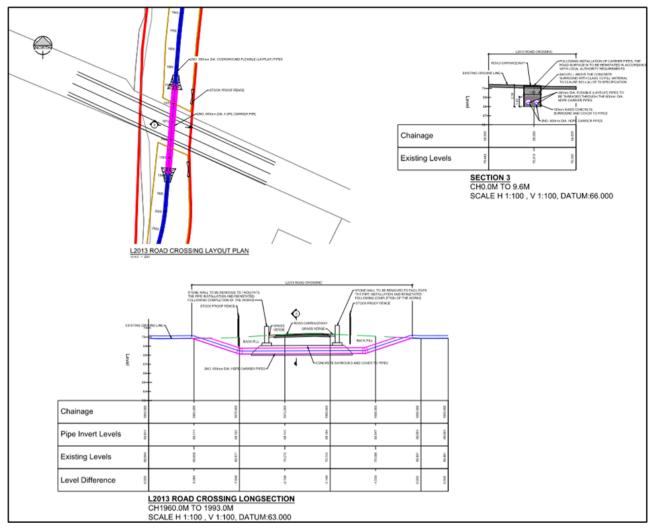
Proposed L2013 road crossing detail. Source Dwg. 24821-MWP-00-00-DR-C-0402 (MWP) | not to scale
